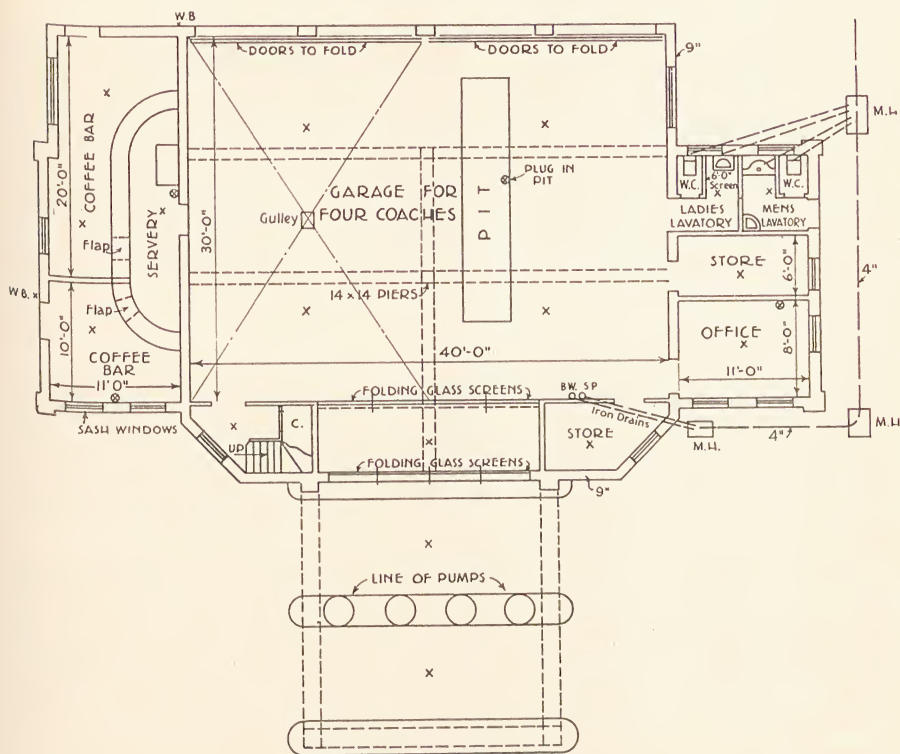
GROUND-FLOOR PLAN OF GARAGE AND PETROL-FILLING STATION.
